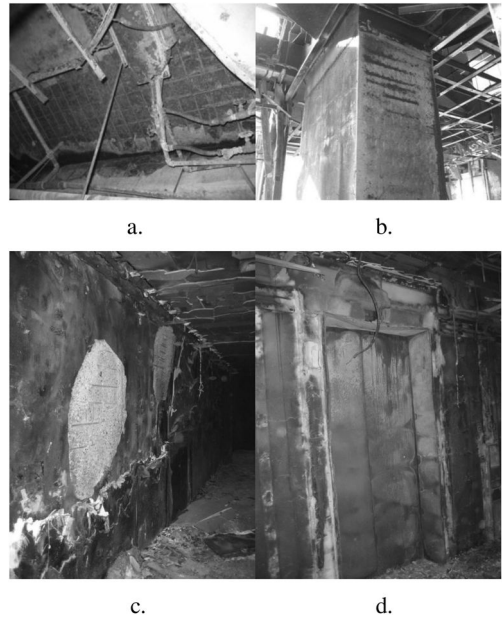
The damaged structures inside the building after the fire incident. a. The steel bars of the concrete roof slab were exposed. b. Cracks and map cracks were formed on the surface of the column. c. The concrete walls were spalled. d. The elevator doors were severely deformed.
